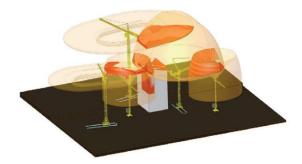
IMAGE : Source: (Ebner;Kammergruber;Horenburg;& Günthner, 2012) 3D MODEL SHOWS POTENTIAL COLLISIONS BETWEEN CRANES AT THE CONSTRUCTION SITE
